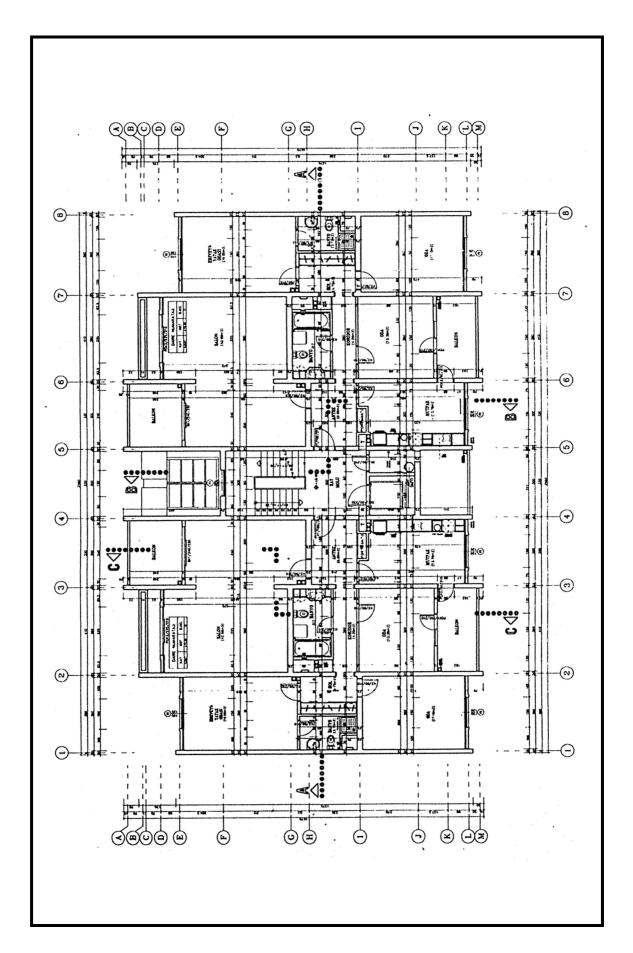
Mavişehir II; C Apartment Building 5th- Floor Plan
